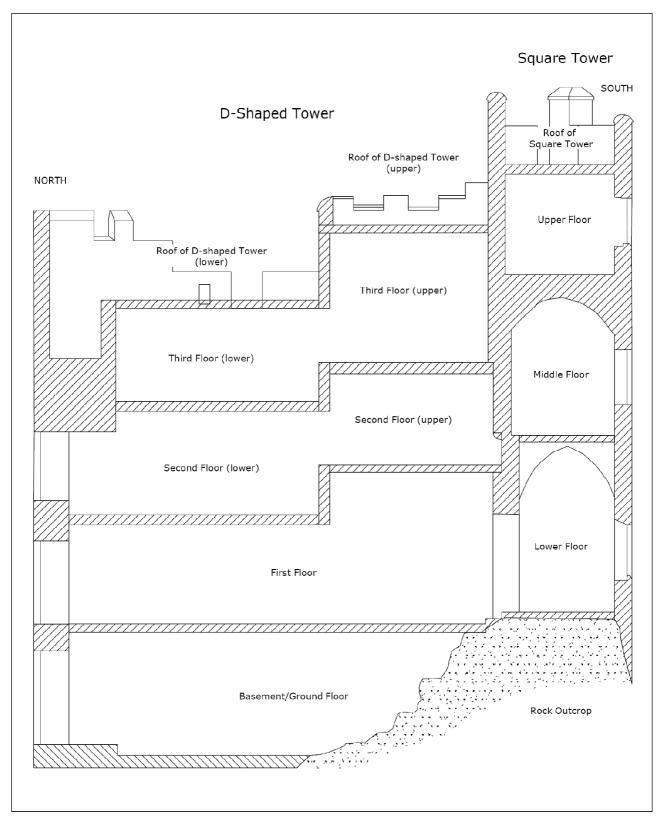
Schematic section through Roch Castle (North to South) showing basic floor layouts present during the building recording
